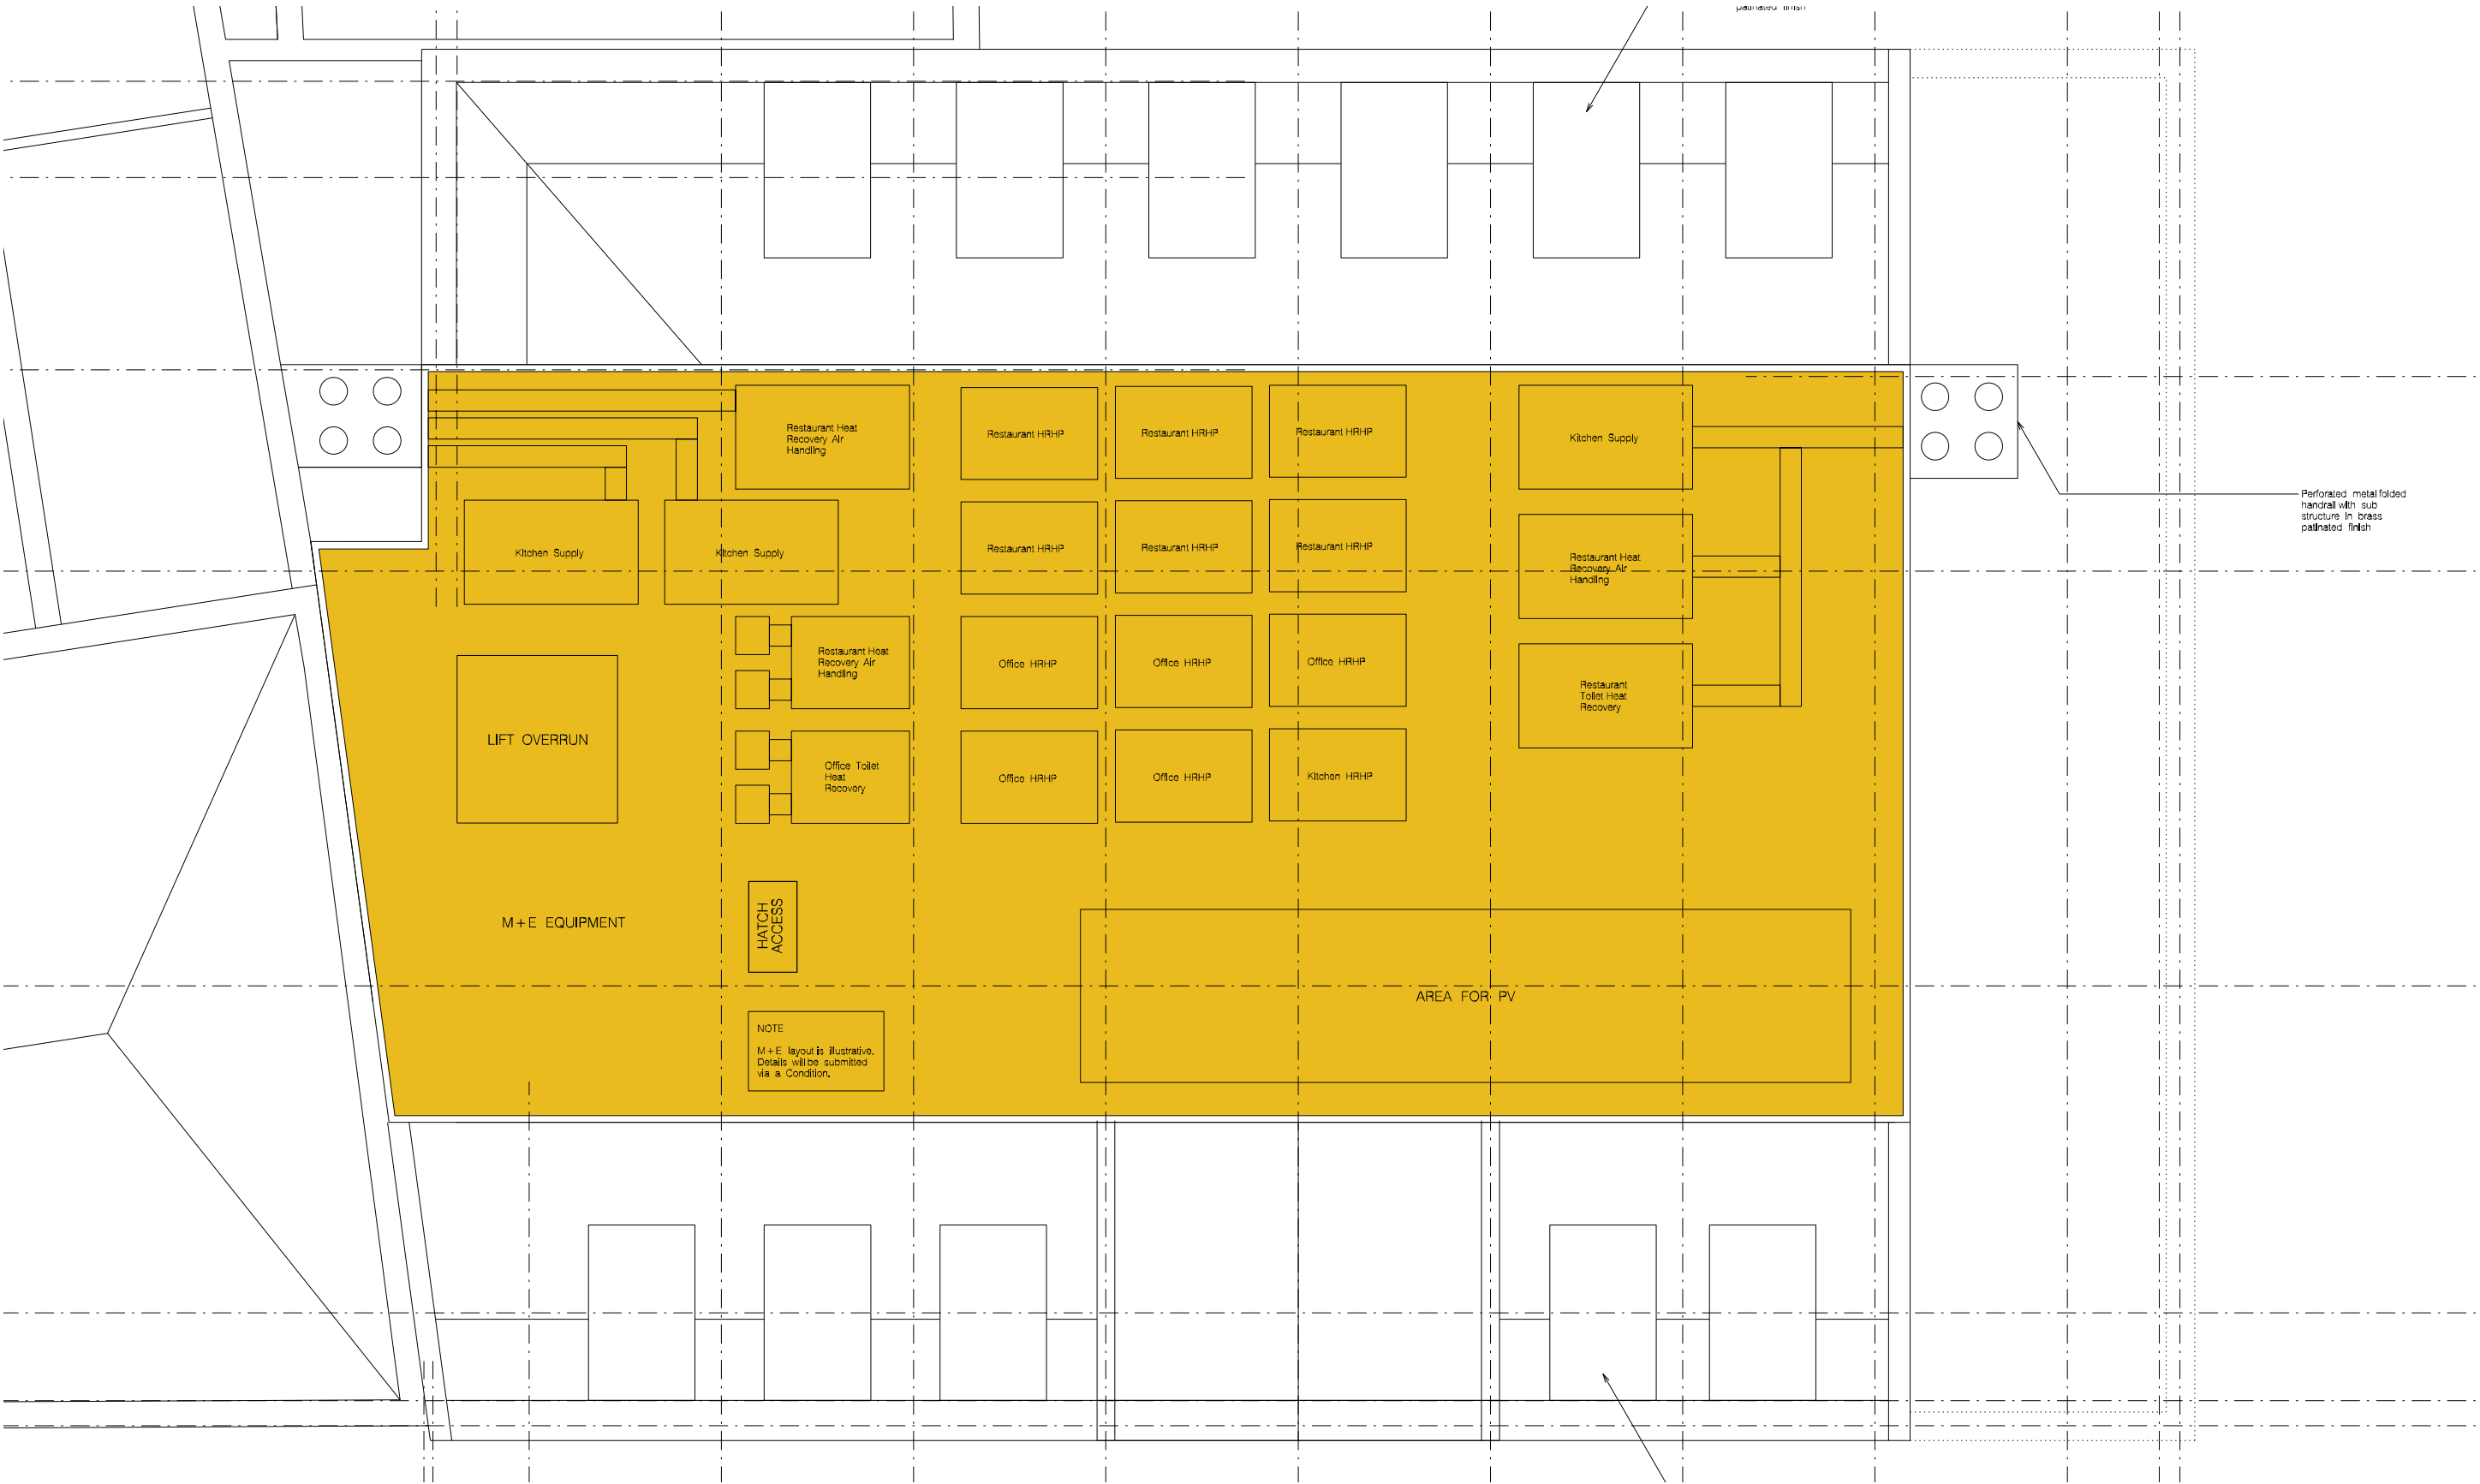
Proposed roof plan showing M+E layout as designed by Webb Yates Engineers
